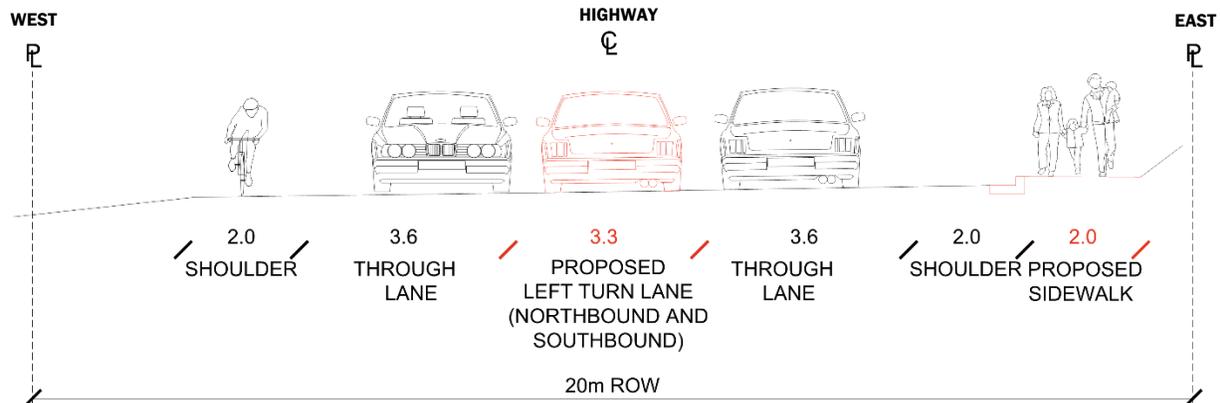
Proposed Highway 101 Cross-Section in Davis Bay and Selma Park
